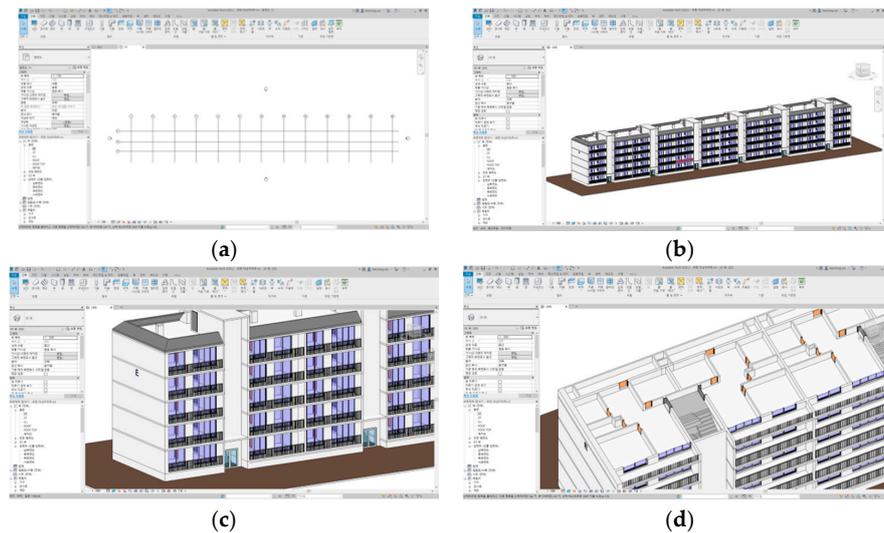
BIM modeling of the Daeseong Apartment Complex through reverse engineering of 3D geometry. (a) Grid setting for the BIM modeling of Building E; (b) BIM modeling of Building E; (c) Elevation of Building E; (d) Sectional view of Building E.
